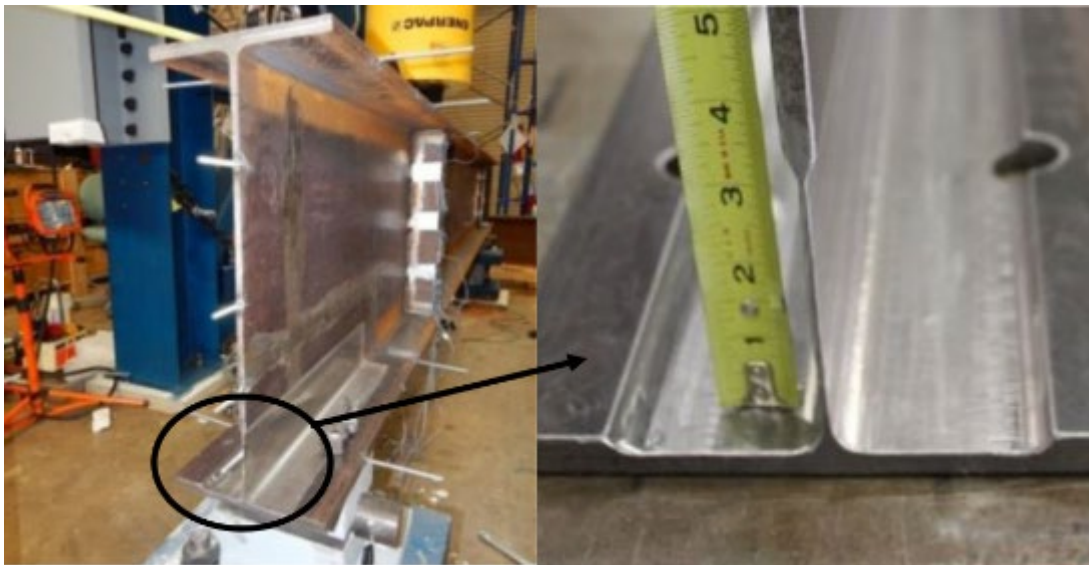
Damaged girder end (Zmetra 2015)
